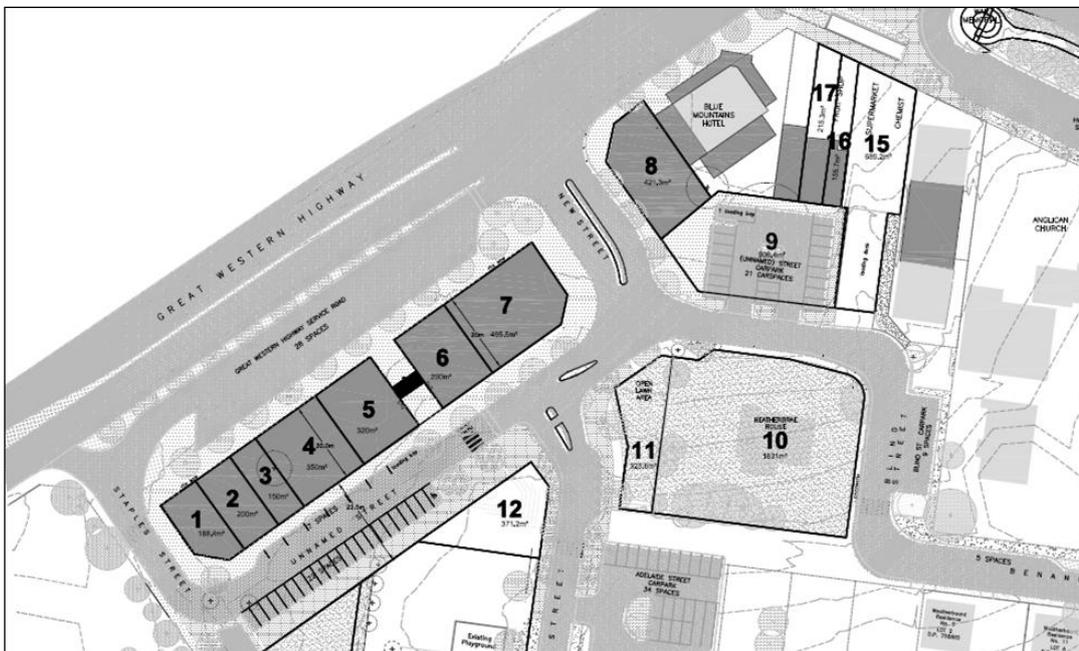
Proposed location of Lots 1-8 along Great Western Highway, subject to final subdivision
